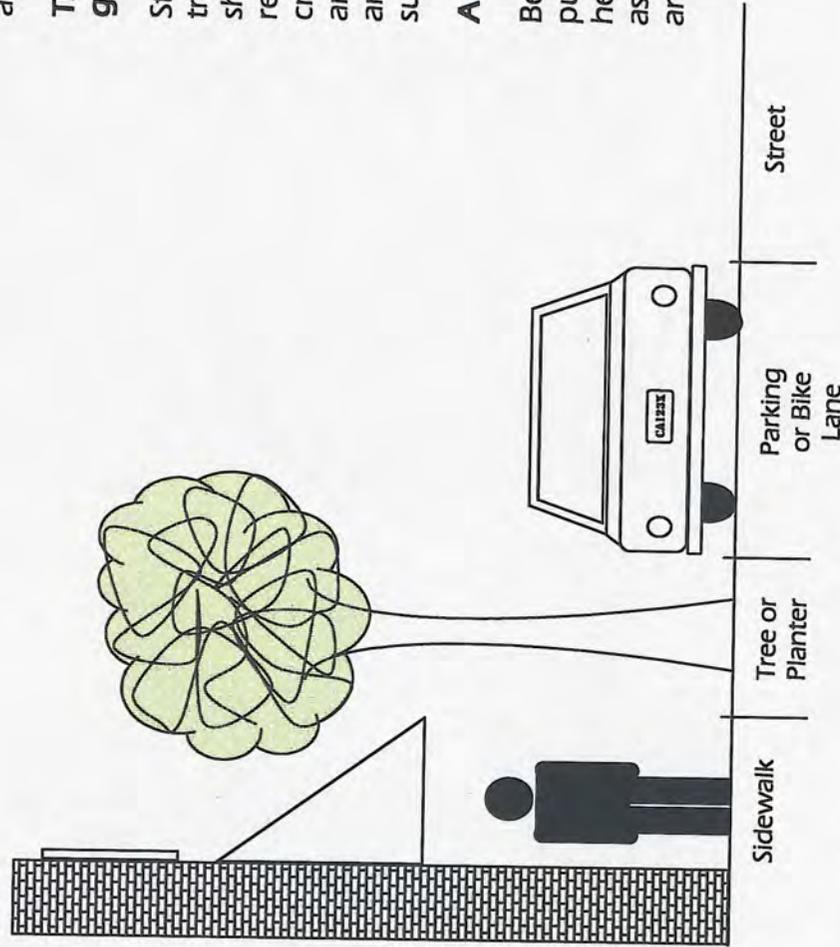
Street cross section with tree/ planting and parking buffer zones.
